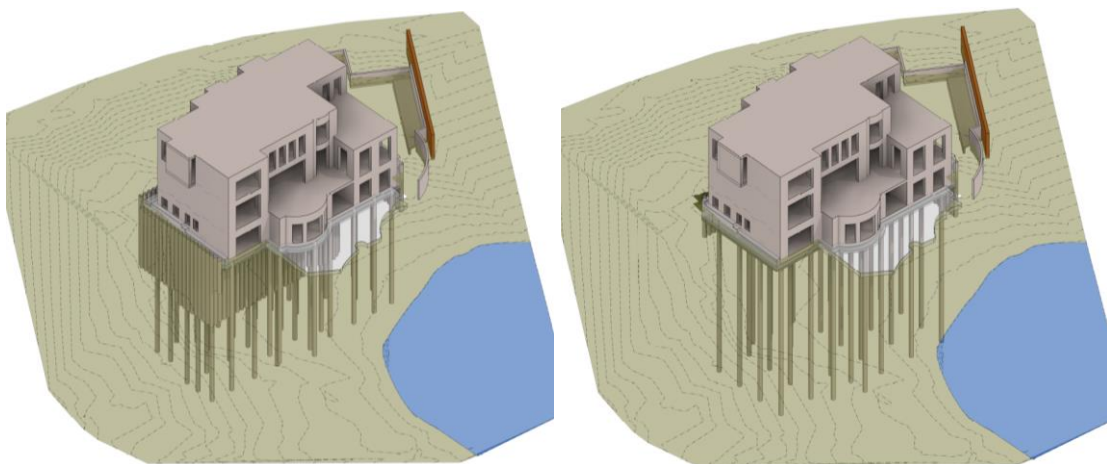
(above left): 2016 approved piling situation under ref. 2015/0441/P, with basement shown. Figure 7.2 (above right): Now proposed piling situation under this new application, with basement level removed.
